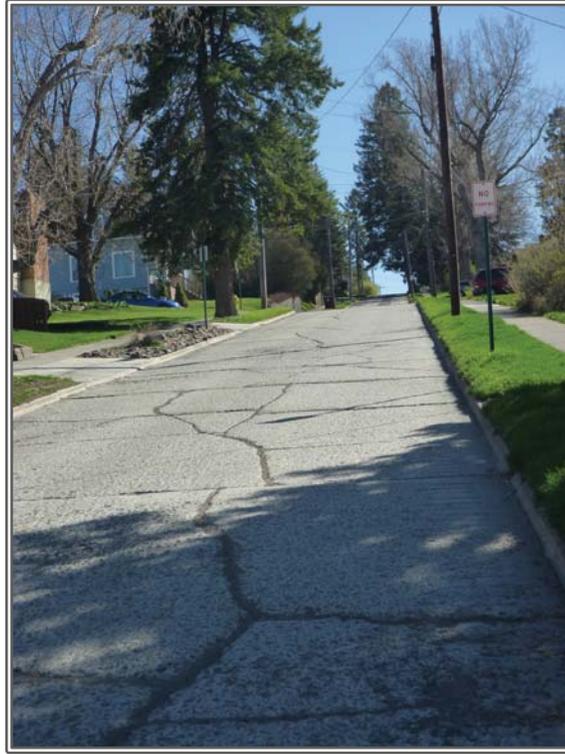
Steep hill heading toward the south along High Street near McKenzie Street
